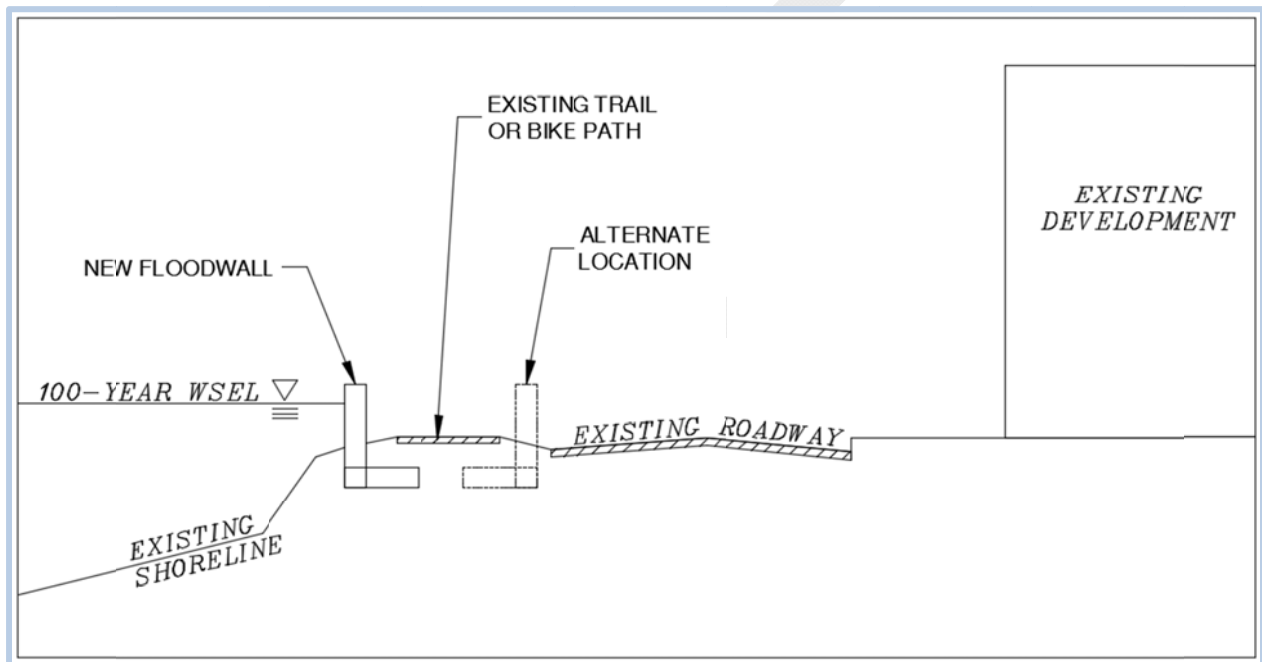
Typical Floodwall Cross Section (Not to Scale)
